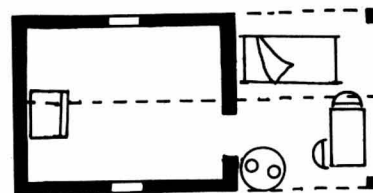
Rocky Mountain Cabin, Summer Floorplan.
